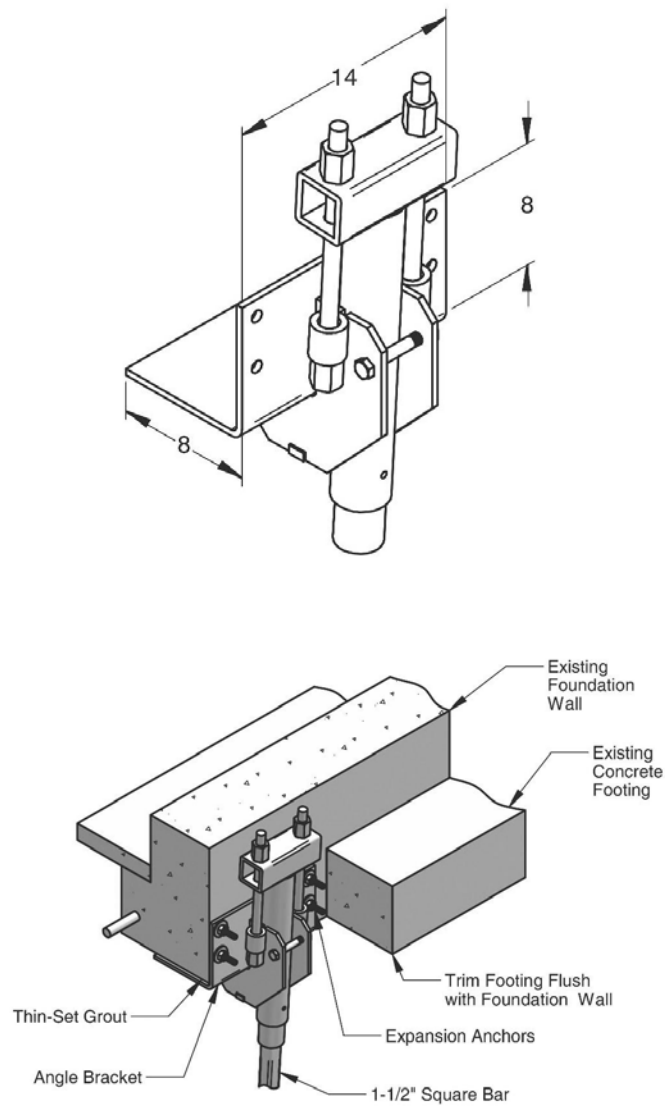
MAGNUM MP1030-150G SIDE LOAD BRACKET
